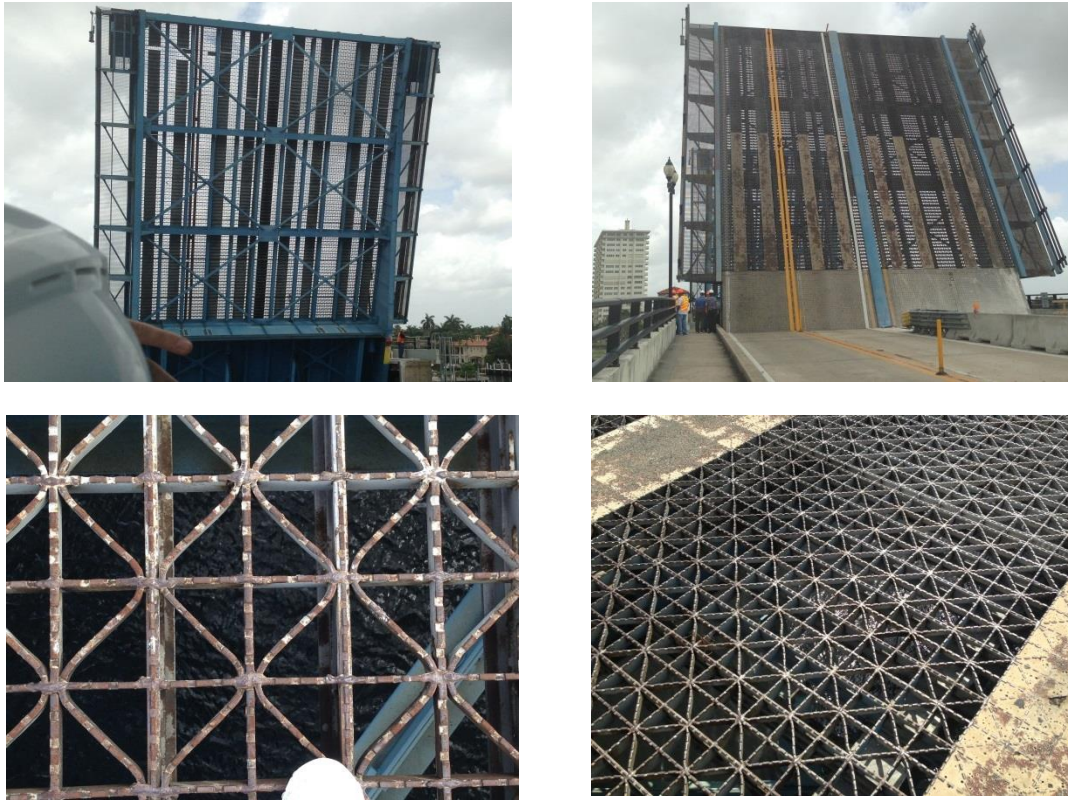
Open Steel Grid Deck (Las Olas Bridge, Fort Lauderdale, FL)
